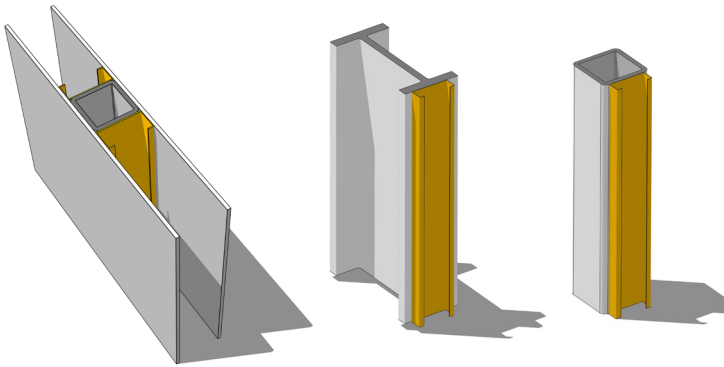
Closed columns/beams examples with coating applied to steel stud channel.
